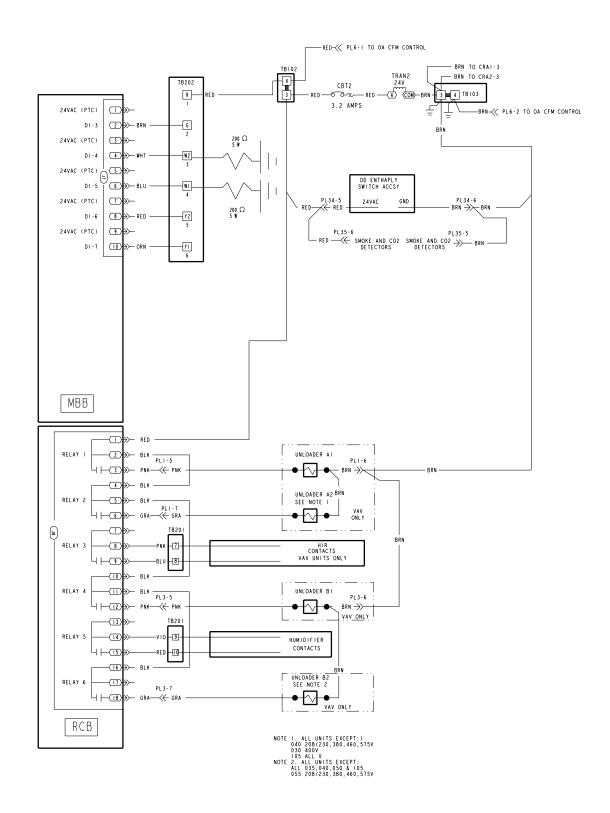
Typical Gas Heat Unit Control Wiring (48Z055-105 Units Shown)
